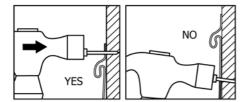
Face Nailing of Vinyl Siding Prohibited
